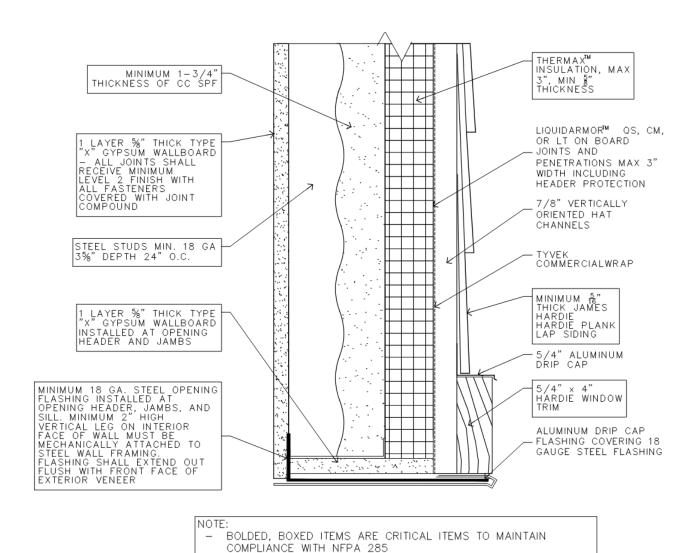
Exterior Wall Construction – Thermax and CC SPF Spray Foam
